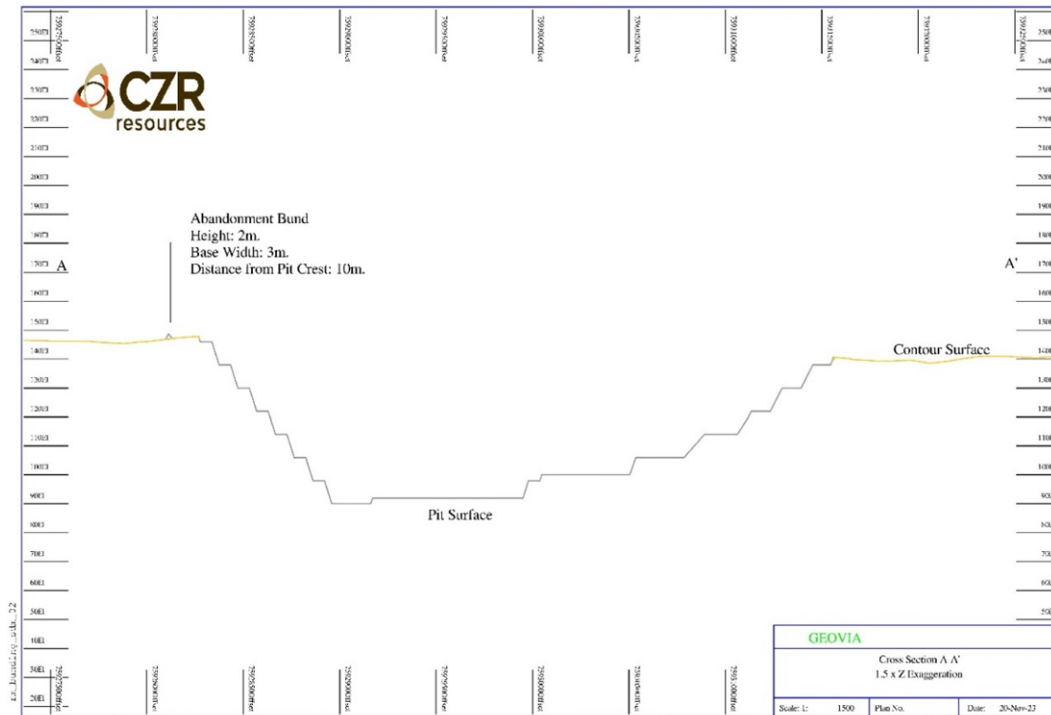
Robe Mesa Backfill Detail
